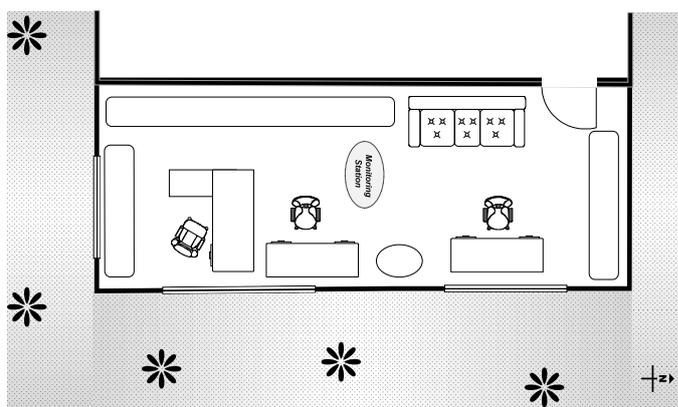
Floor plan of the office (6m x 3m x 3m) and the monitoring station.
